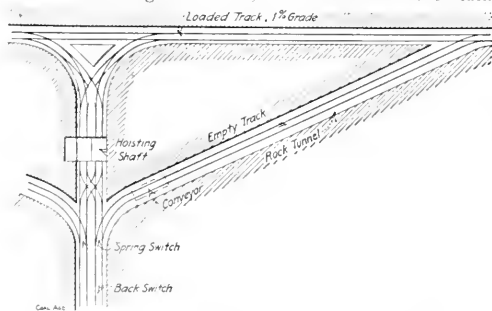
PROPOSED PLAN FOR LOADED AND EMPTY TRACKS AT LANDINGS UNDERGROUND
